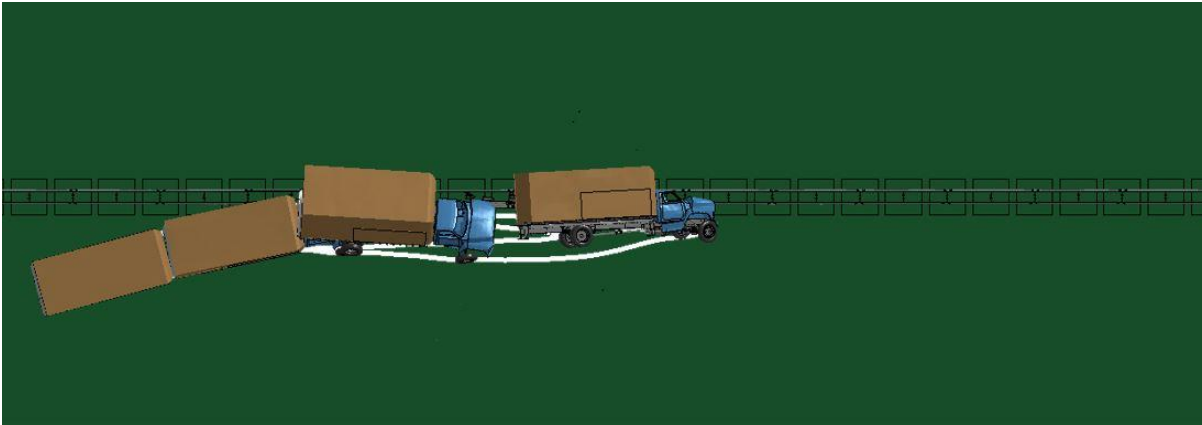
A single-unit truck impacting the double-faced 29-inch steel-blockout Thrie-beam guardrail at 56 mph (90 km/h) and 15°.
